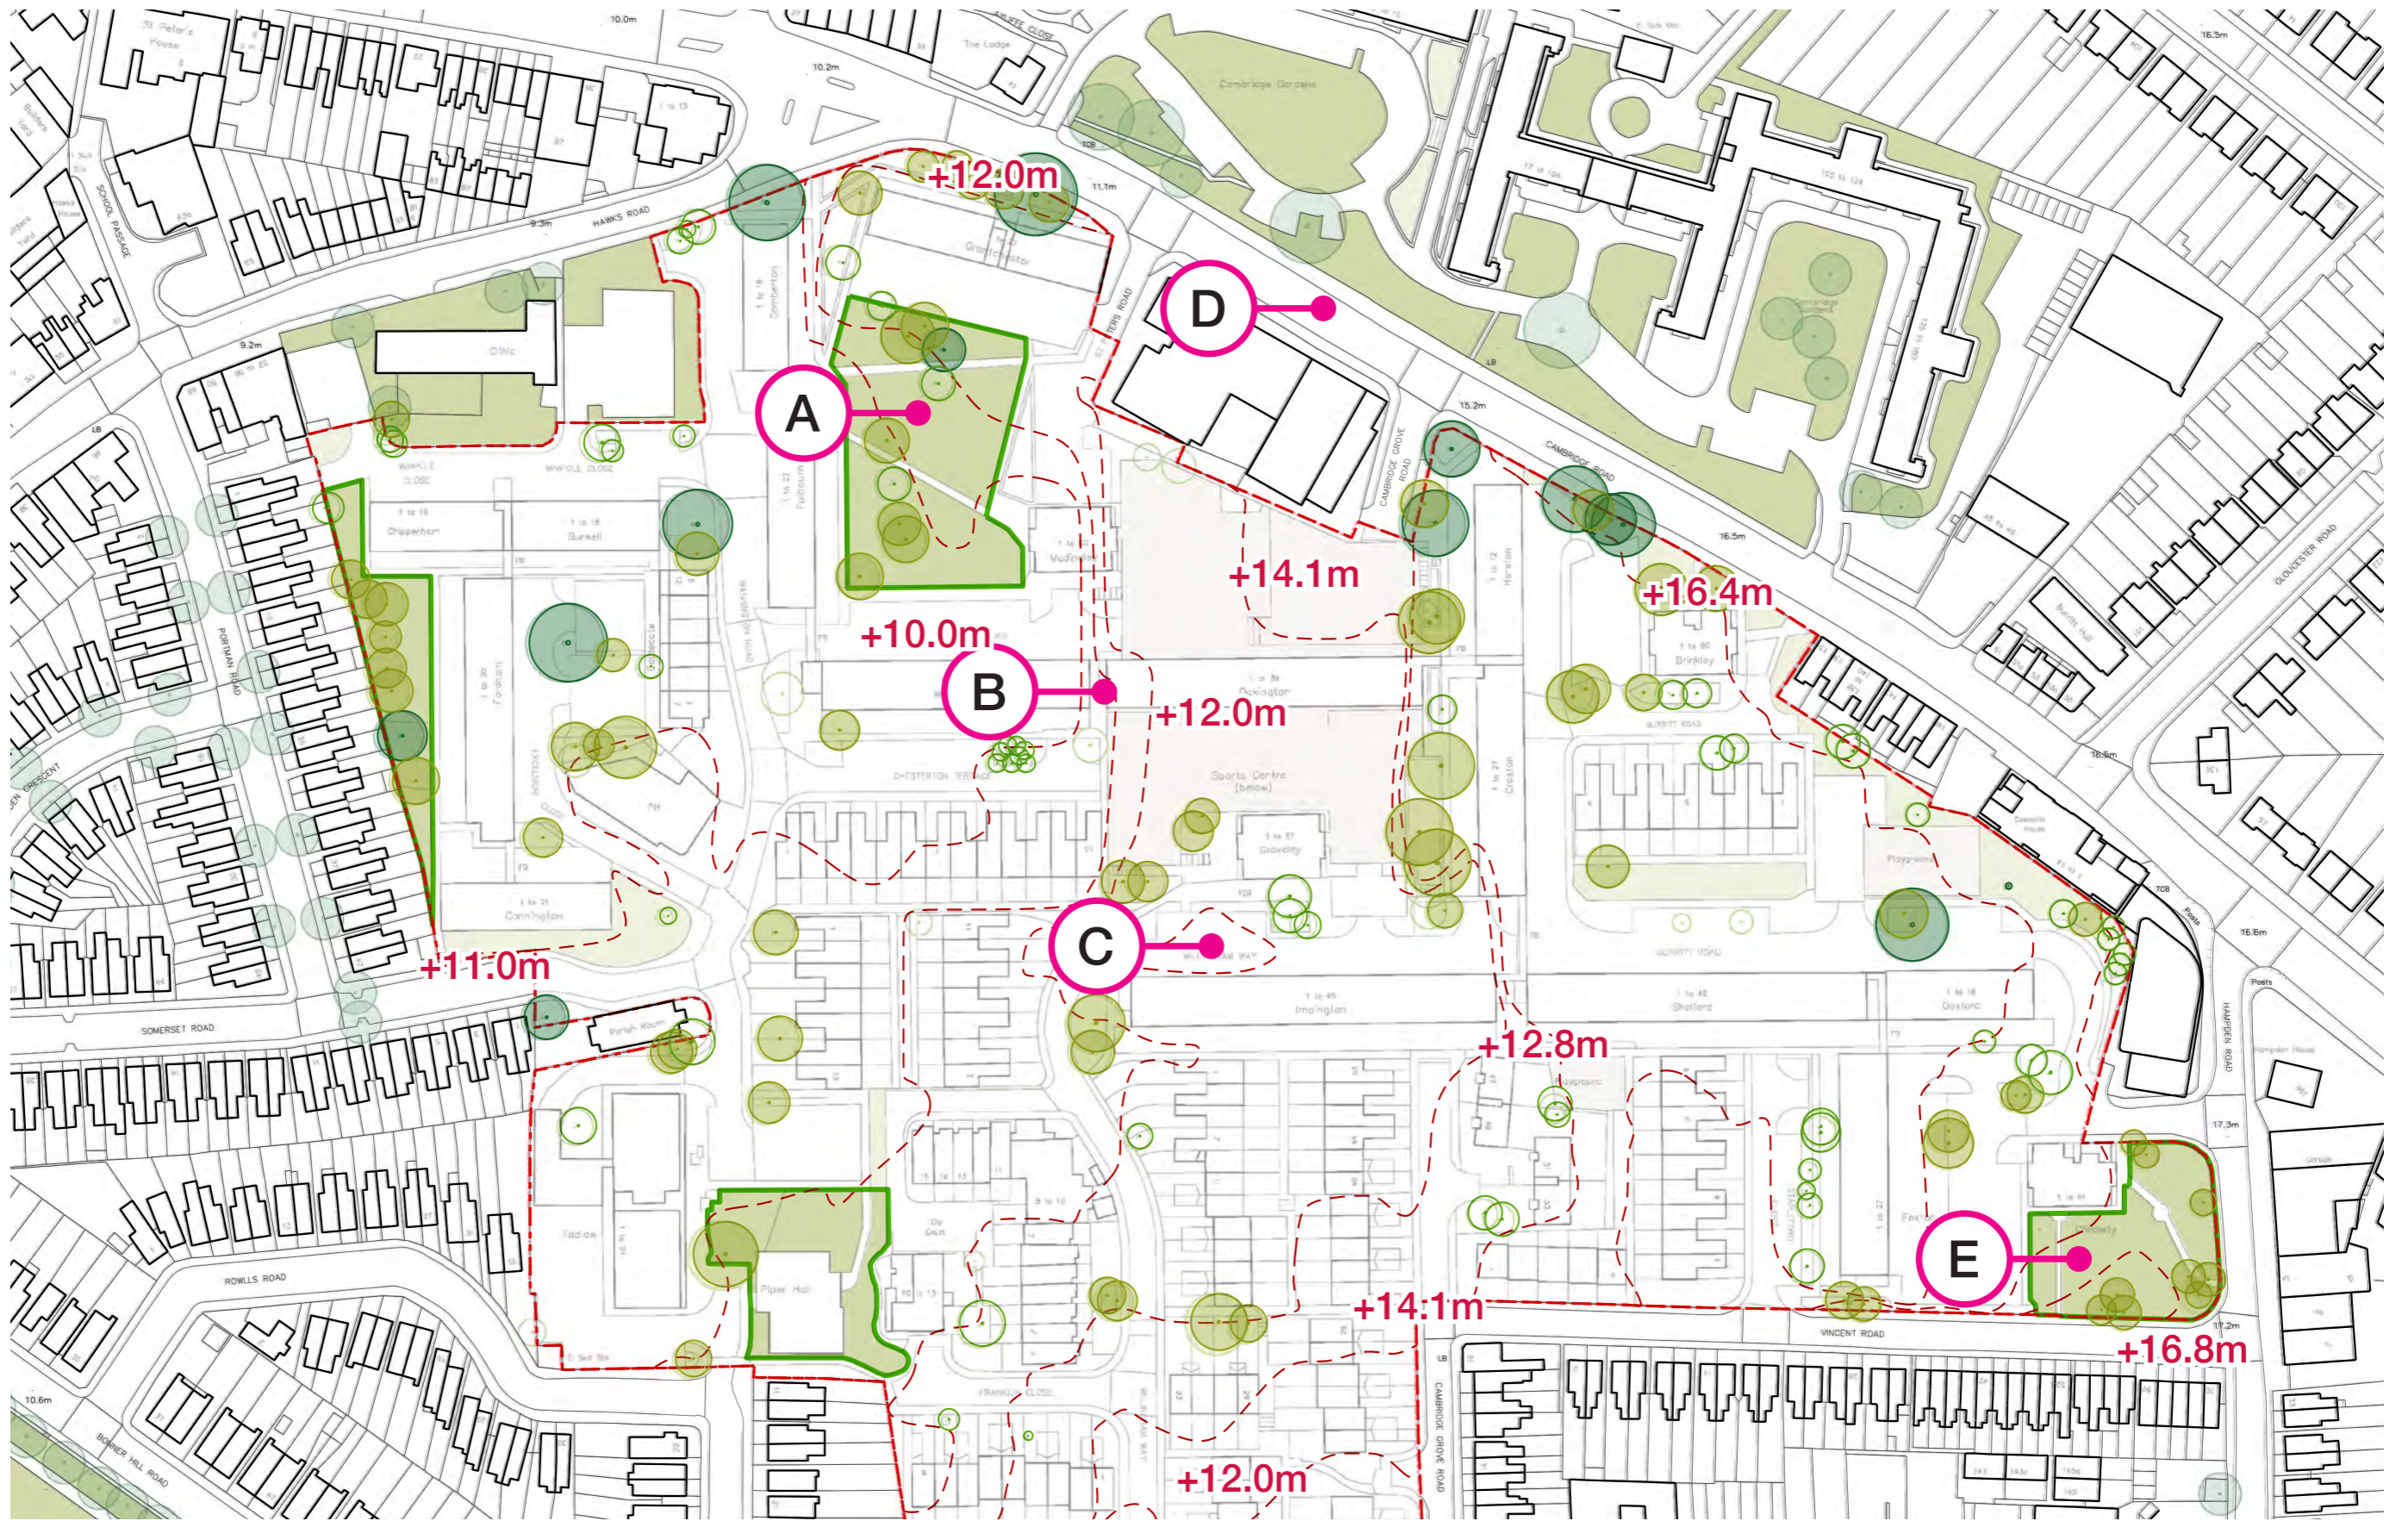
Existing estate layout - prevailing topography, site levels and significant level steps
